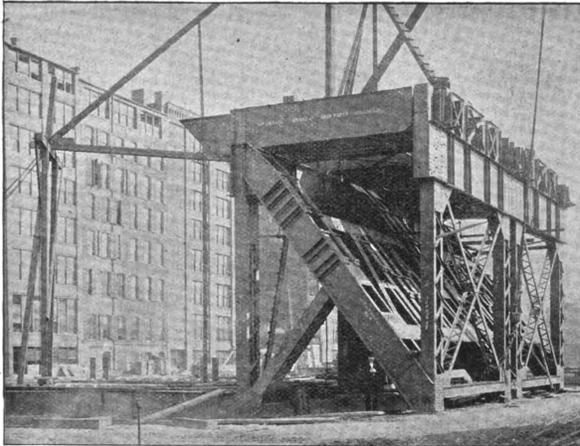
West Pier, Four Track Bridge, West Side Metropolitan Elevated, Short Span adjoining.
